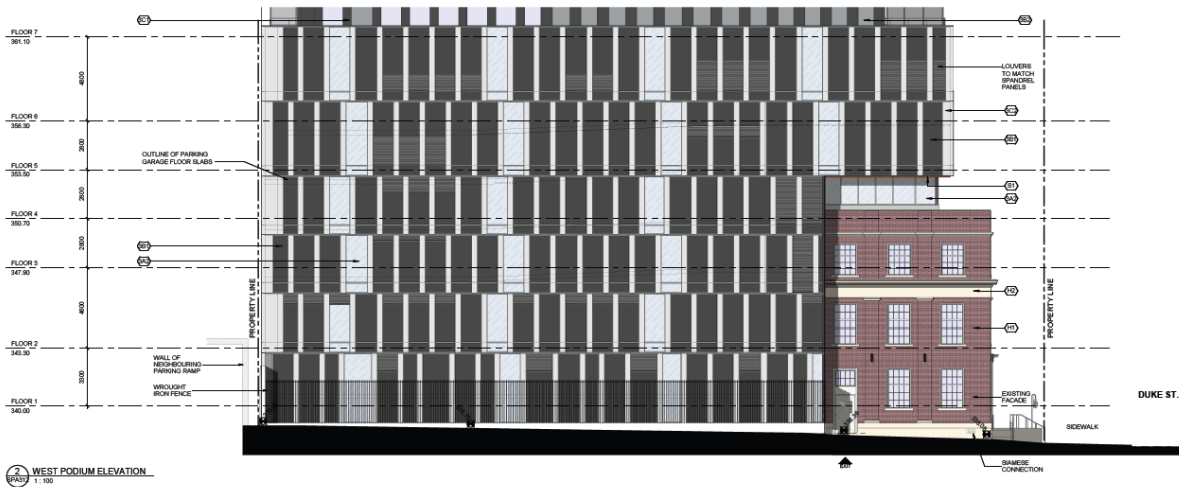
Architectural Drawing of West Side Façade of Proposed Development
